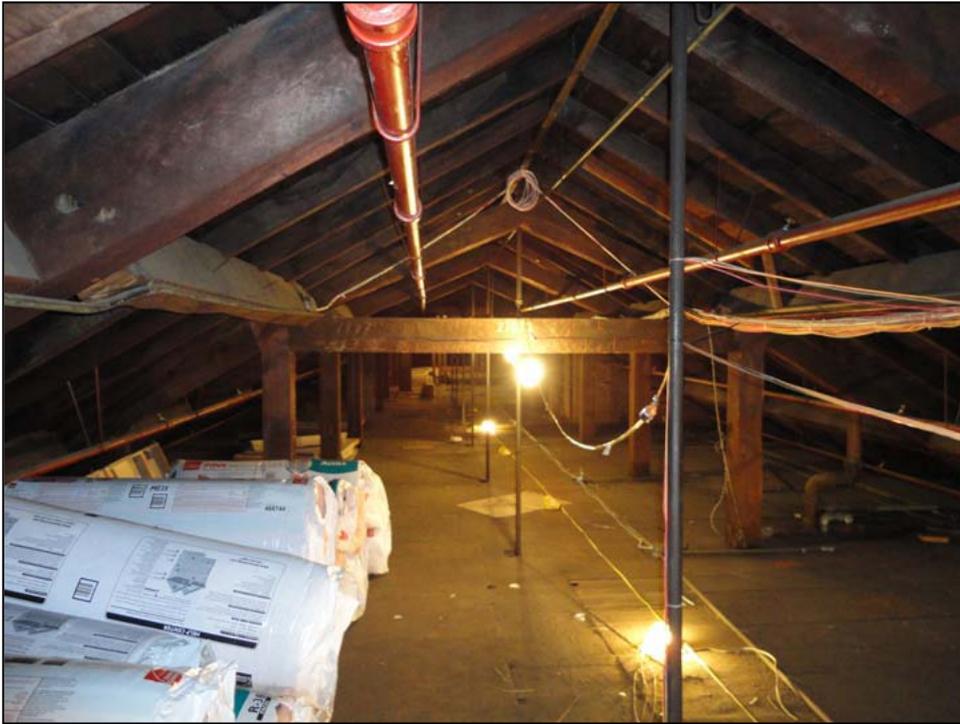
Building 27, attic framing showing transition from queen-post trusses to heavy rafter and purlin system at east end of building, 2010.
